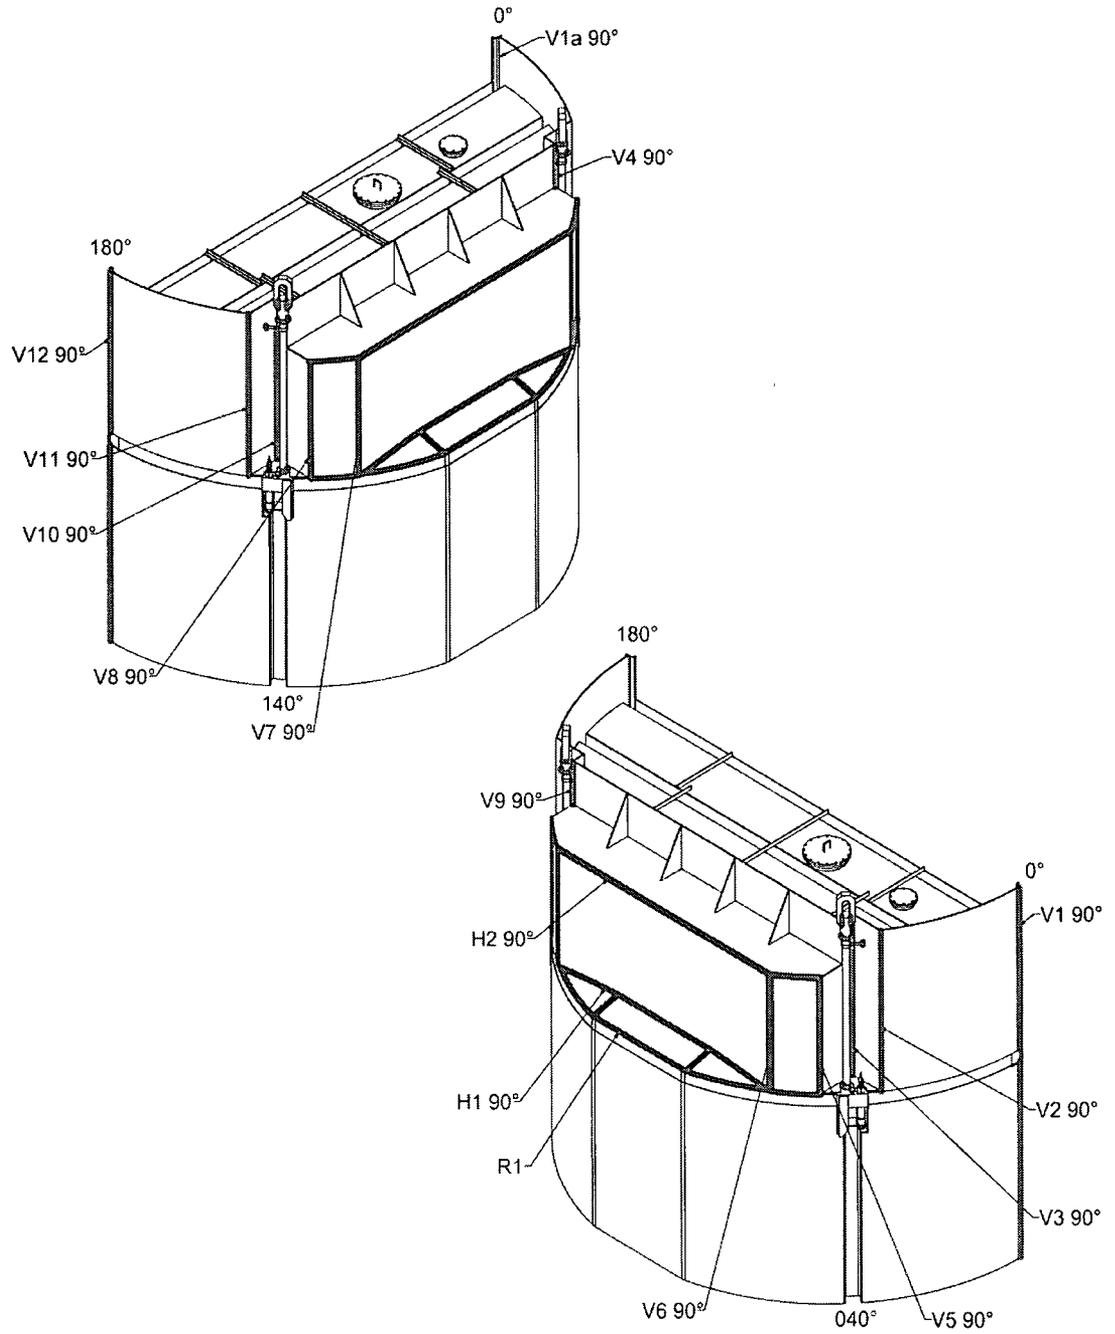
Inspections: Outer Dryer Hood and Cover Plate (Square Hood Dryer)
